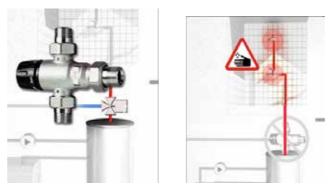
Thermostatic mixer should be installed in the outlet of solar system for end-user protection.
